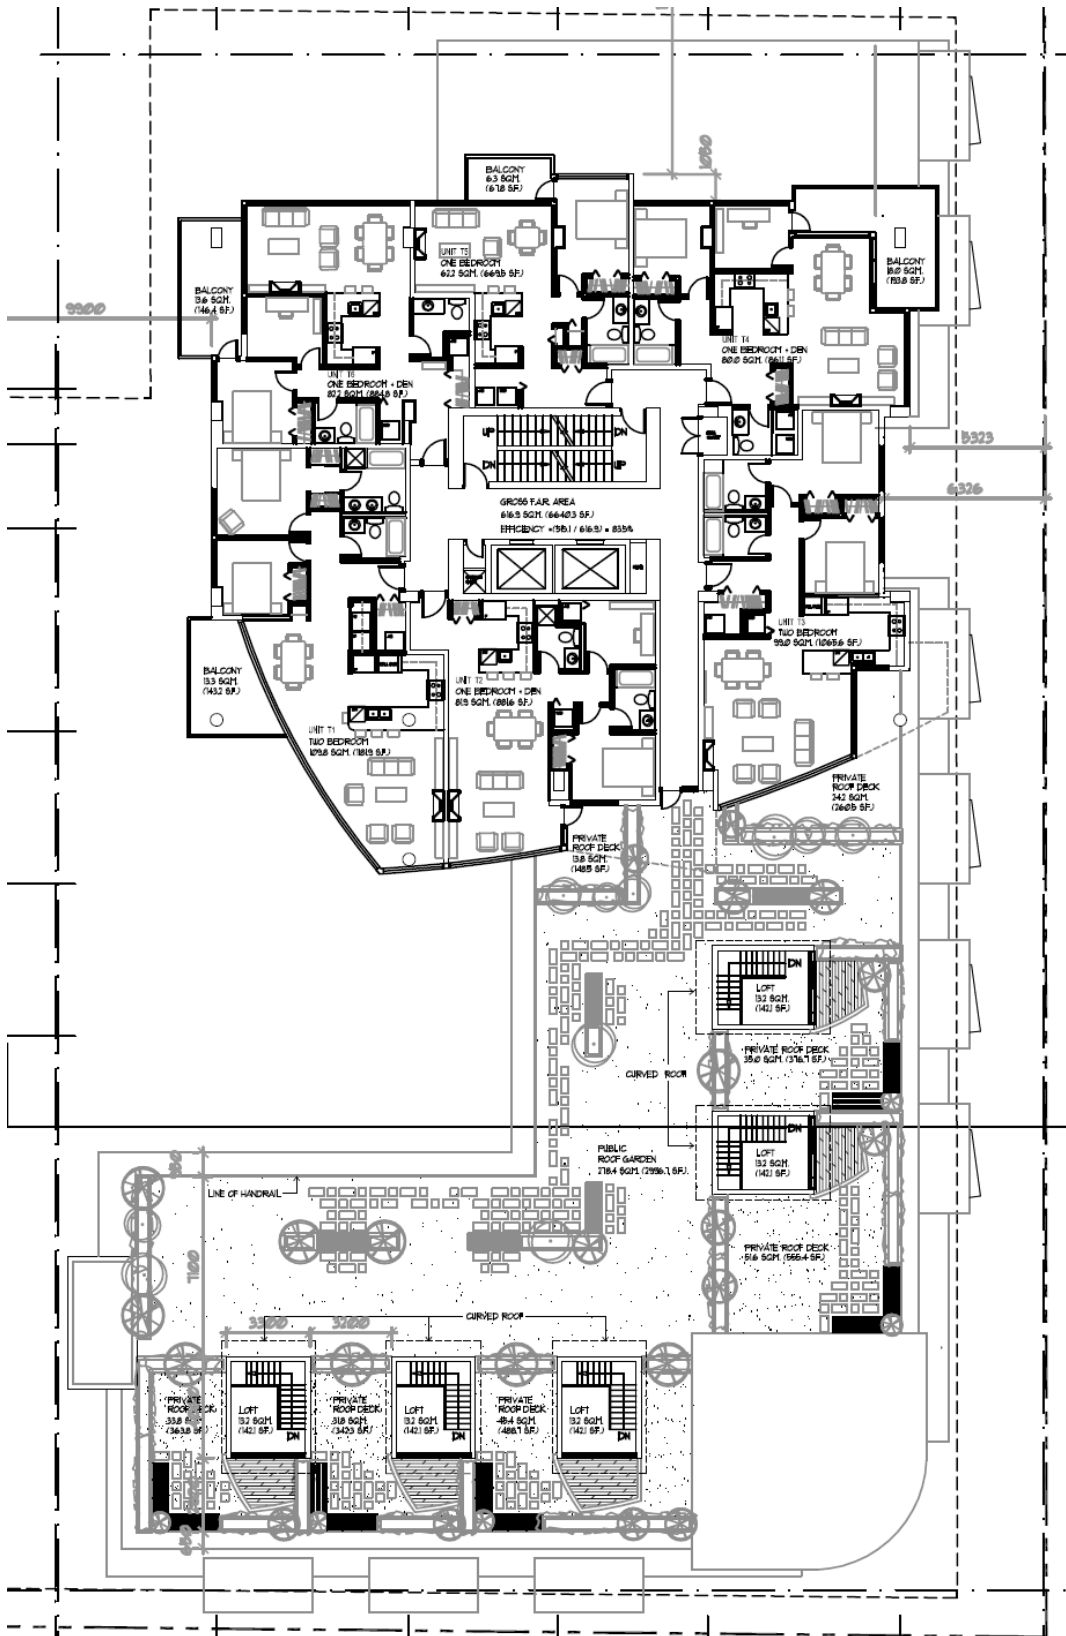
Floor Plan 5th floor of Tower showing roof of surrounding townhouse units
